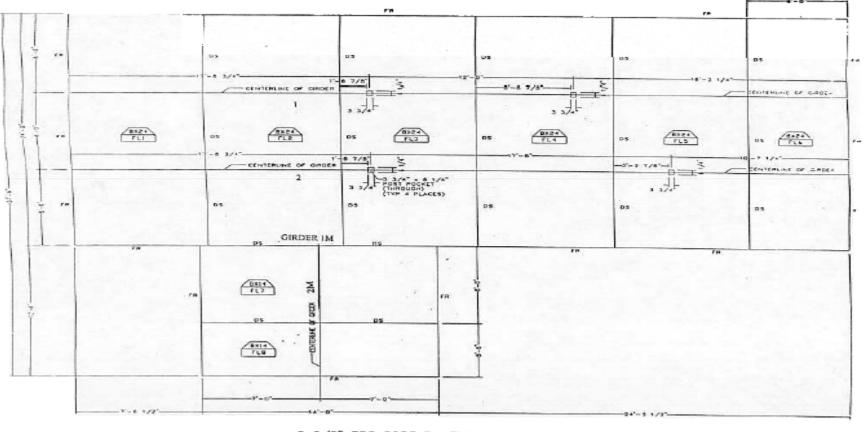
Sedro-Woolley SIP Home: Girder and Floor Panel Layout
